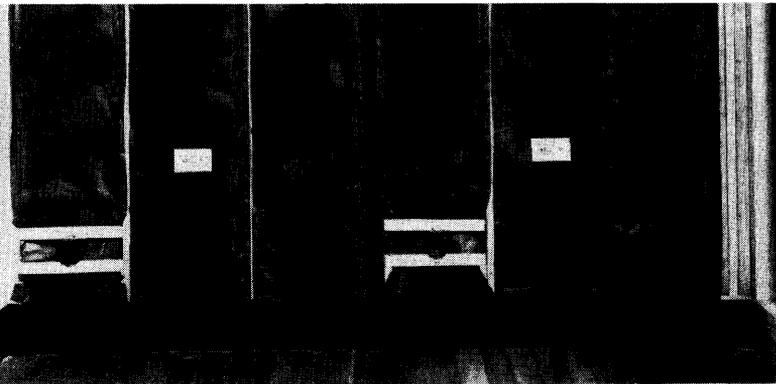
VIEW OF INTERIOR SURFACES OF WALLS P AND R BEFORE LATH AND PLASTER WERE APPLIED SHOWING METHODS OF INSTALLING BLANKET INSULATION, ELECTRICAL OUTLETS, AND BARRIER SEAL AROUND OUTLETS.
